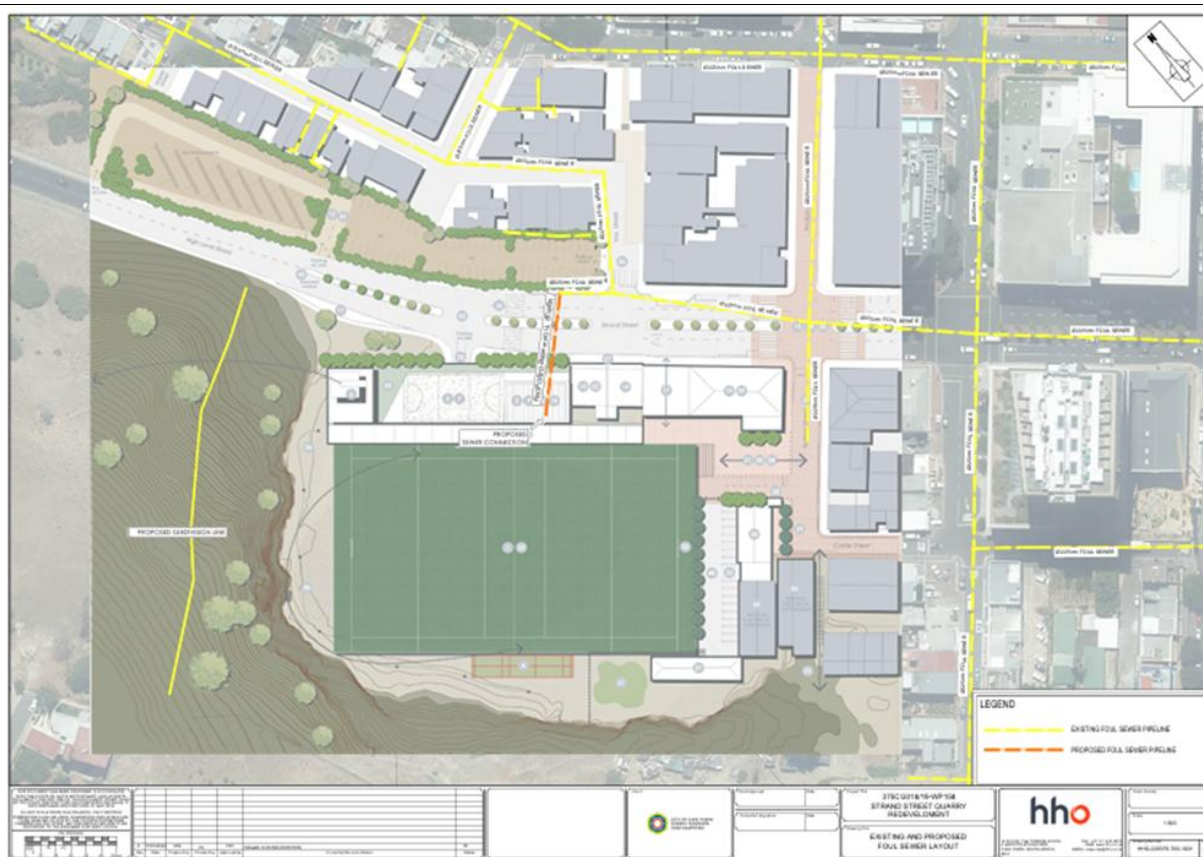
Existing and proposed foul sewer layout (HHO, 2023)
